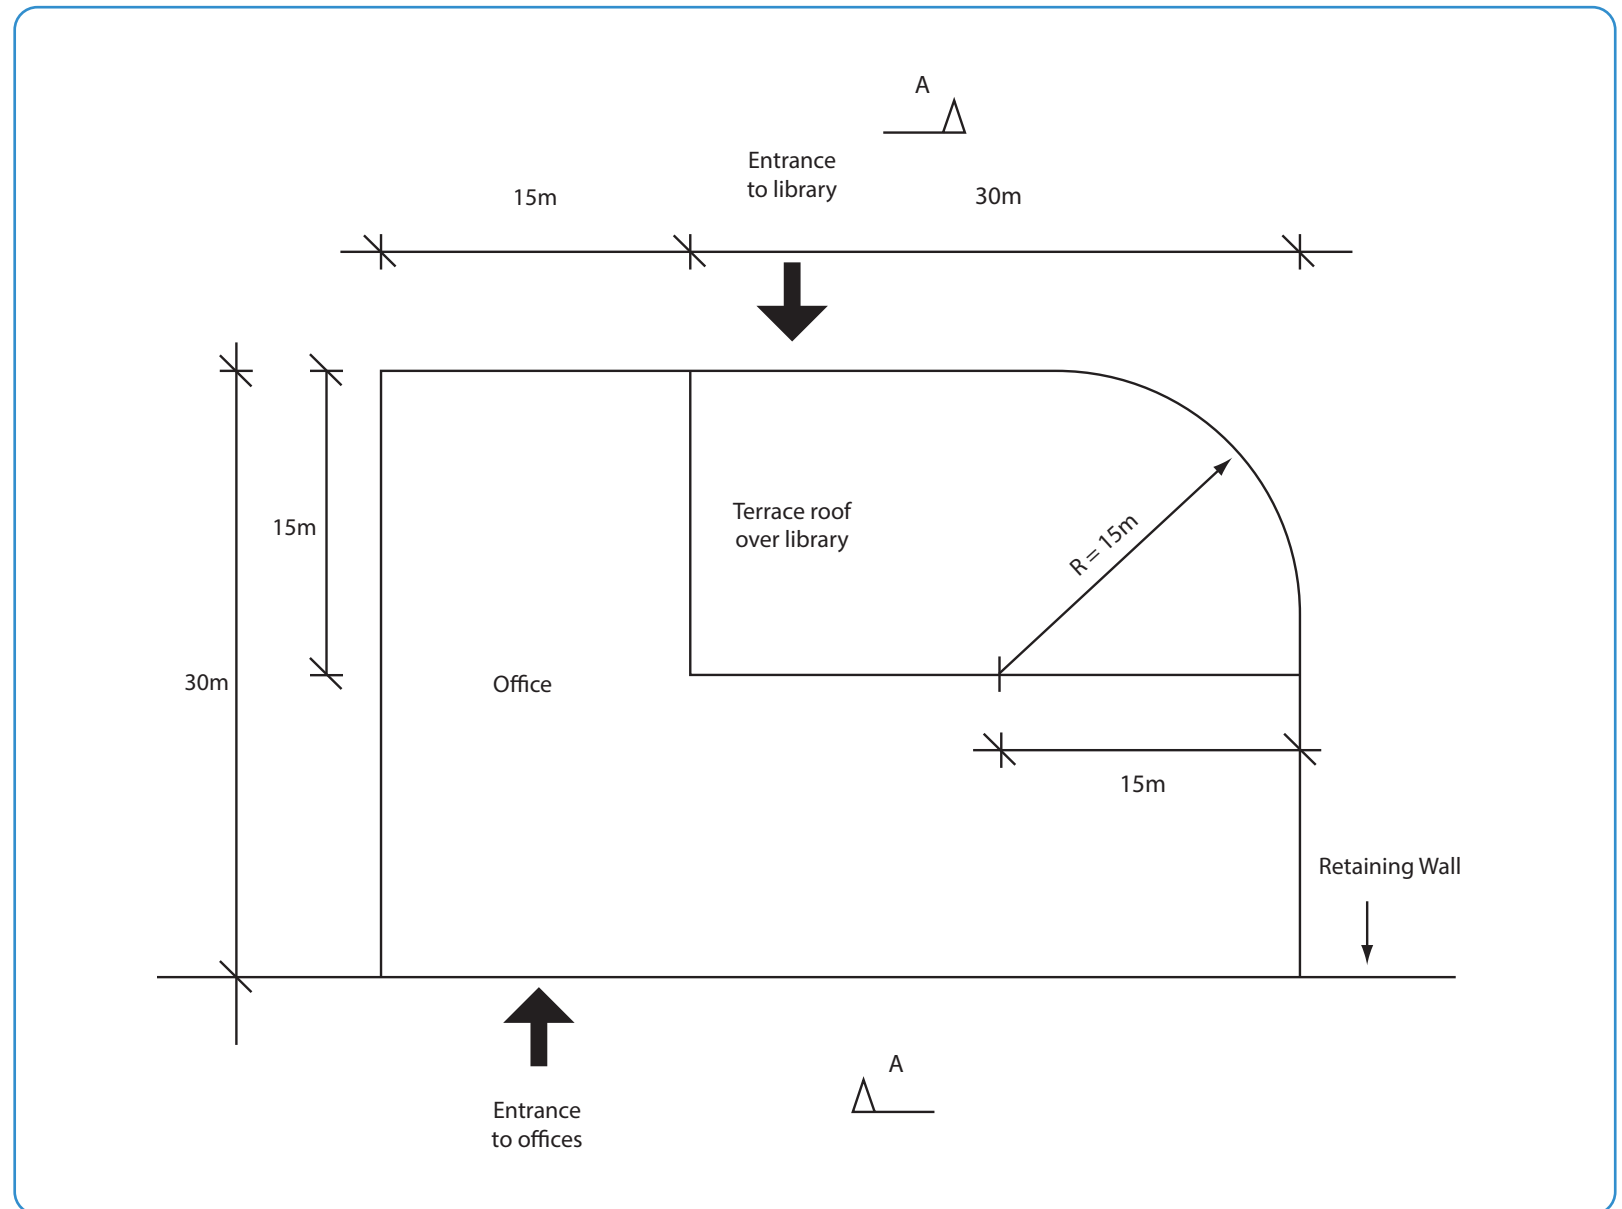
Plan at ground floor (dimensions may be taken to be to the centre line of structure (walls or columns)).
